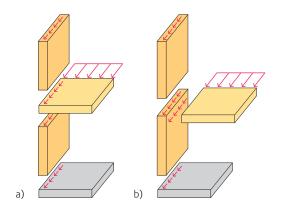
Transfer of horizontal forces between wall panels and floor slabs for supported and suspended floor structures.
